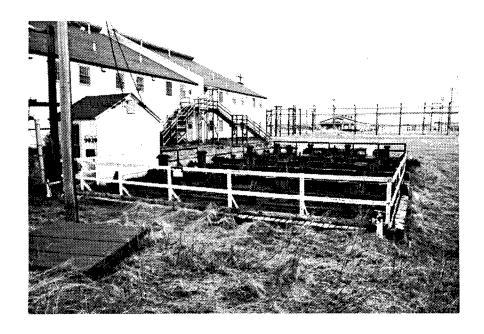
Building 9020: Boiling Tub Settling Pit measuring 48 feet and 4 inches by 12 feet and 10 inches with bottoms sloping east to west from 5 to 7 feet.
